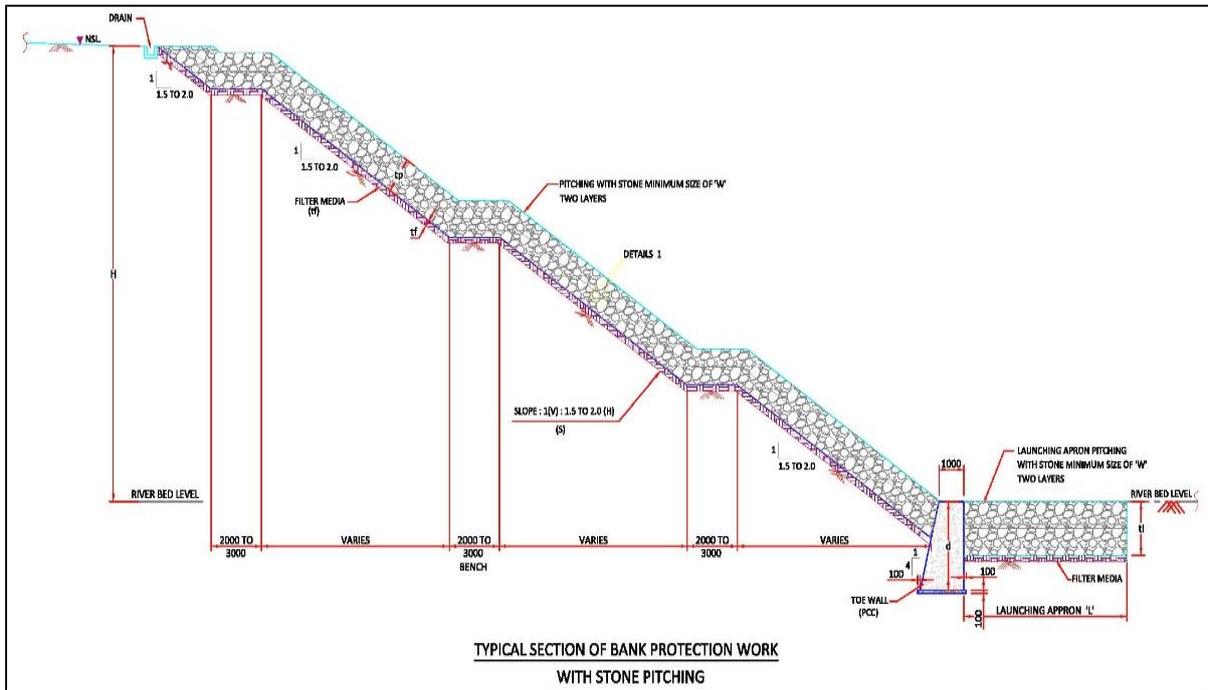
Revetment using Boulders pitching with PCC toe wall and/or launching apron
